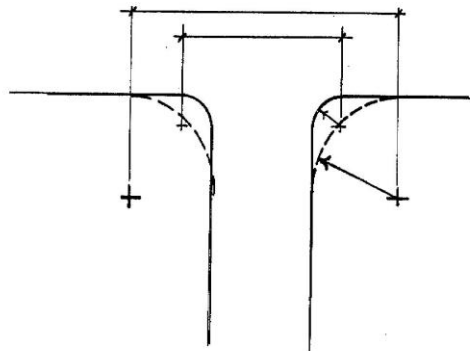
Plan-view diagram of a street intersection. Reducing the radius of street corners slows turning vehicle traffic and shortens pedestrian crosswalks.
